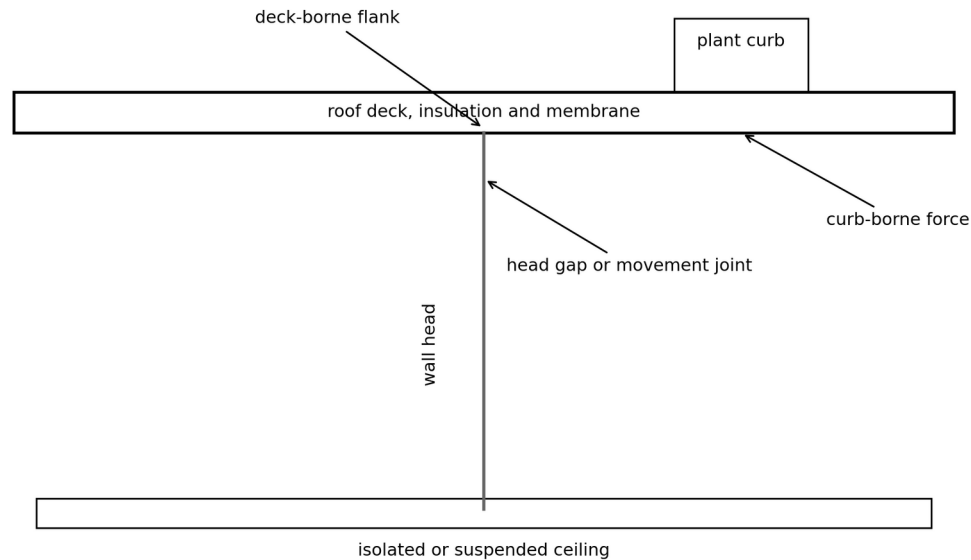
Roof assemblies couple exterior loading, rooftop plant, deck flanking and wall-head movement. Author's original diagram.
